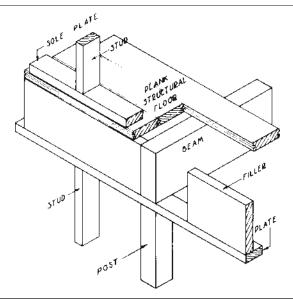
Spaced Beam Bearing at Second Floor Exterior Wall
